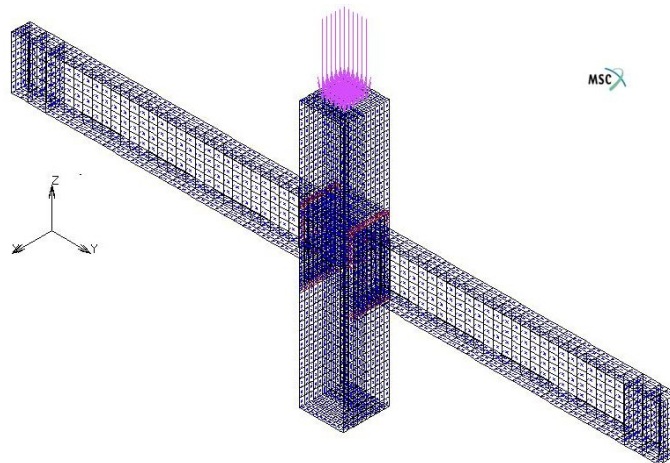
Steel Beam-to-Column Joint Finite Element Model
